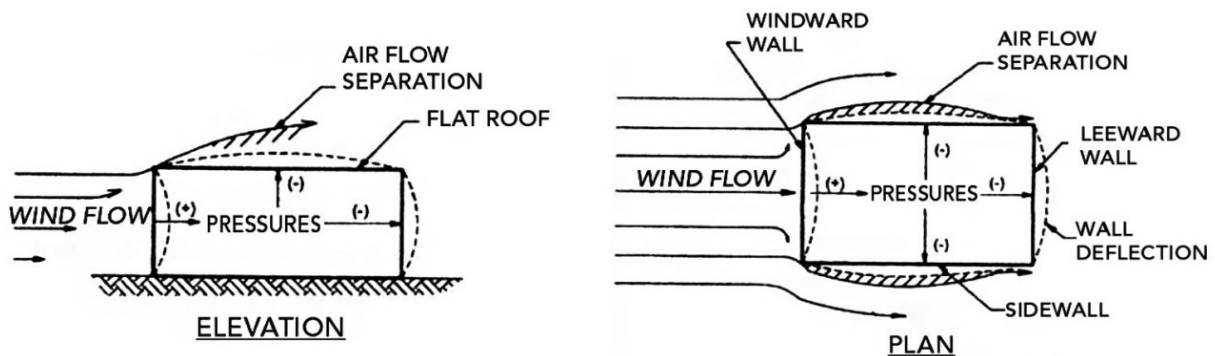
Distribution of pressures (+) and suctions (-) on flat roof low rise building
